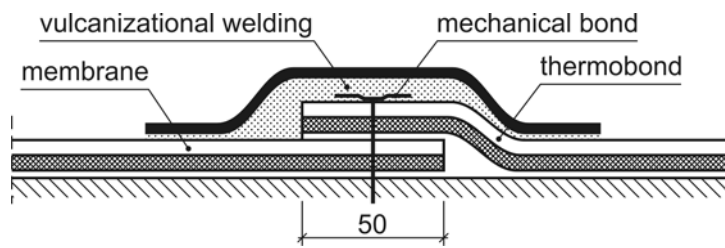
The scheme of gluing fastening of EPDM membrane [28]
